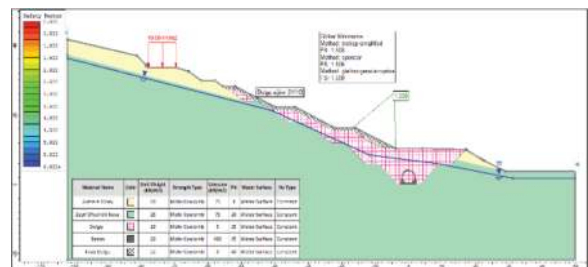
Static stability analysis of embankment up to the first two benches of the diversion outlet (FS = 1.508 > 1.50).
